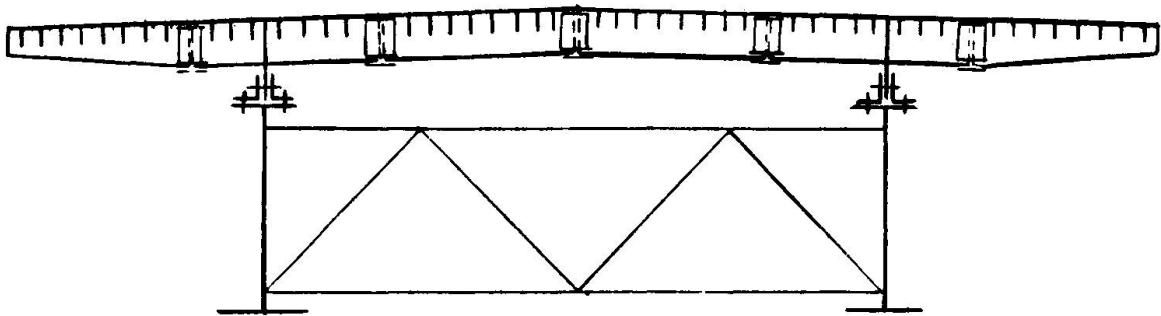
Cross-section of unified steel superstructure with a covering orthotropic plate.
